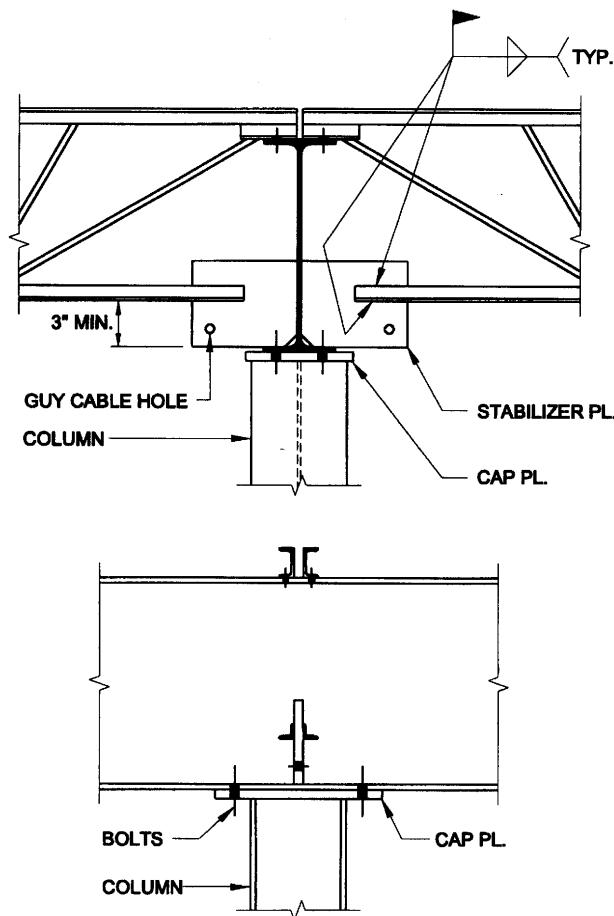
Beam framing continuously over column top, stability provided with welded joist-chord extensions above column top.
